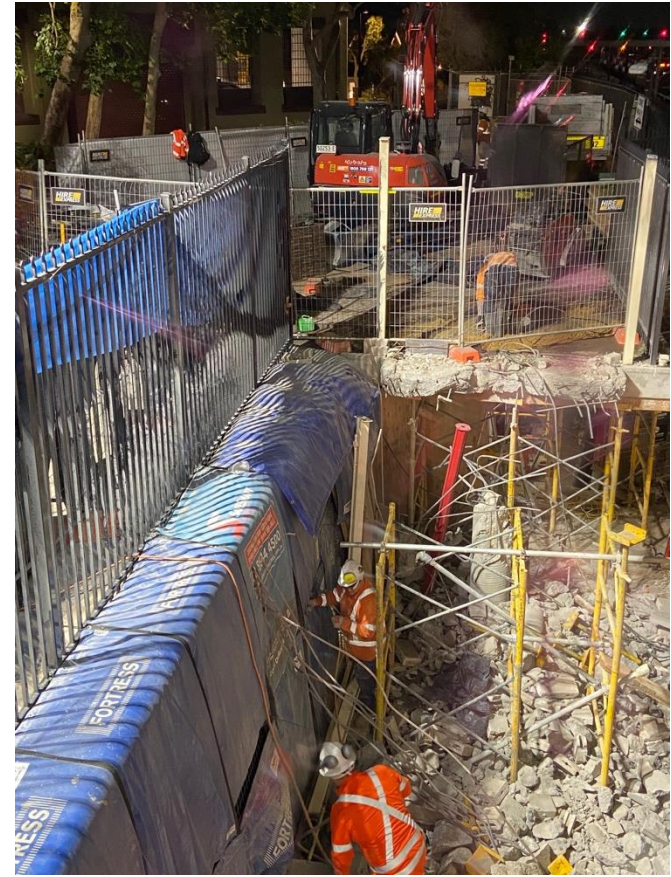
Evidence of heritage wall protection during Platform 10 stairs demolition (photo provided by the contractor).
